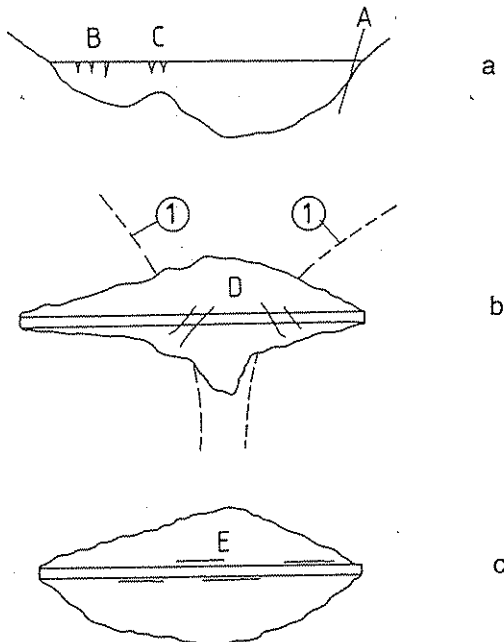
Cracking patterns in embankment dams (adapted from Thomas 1976).
